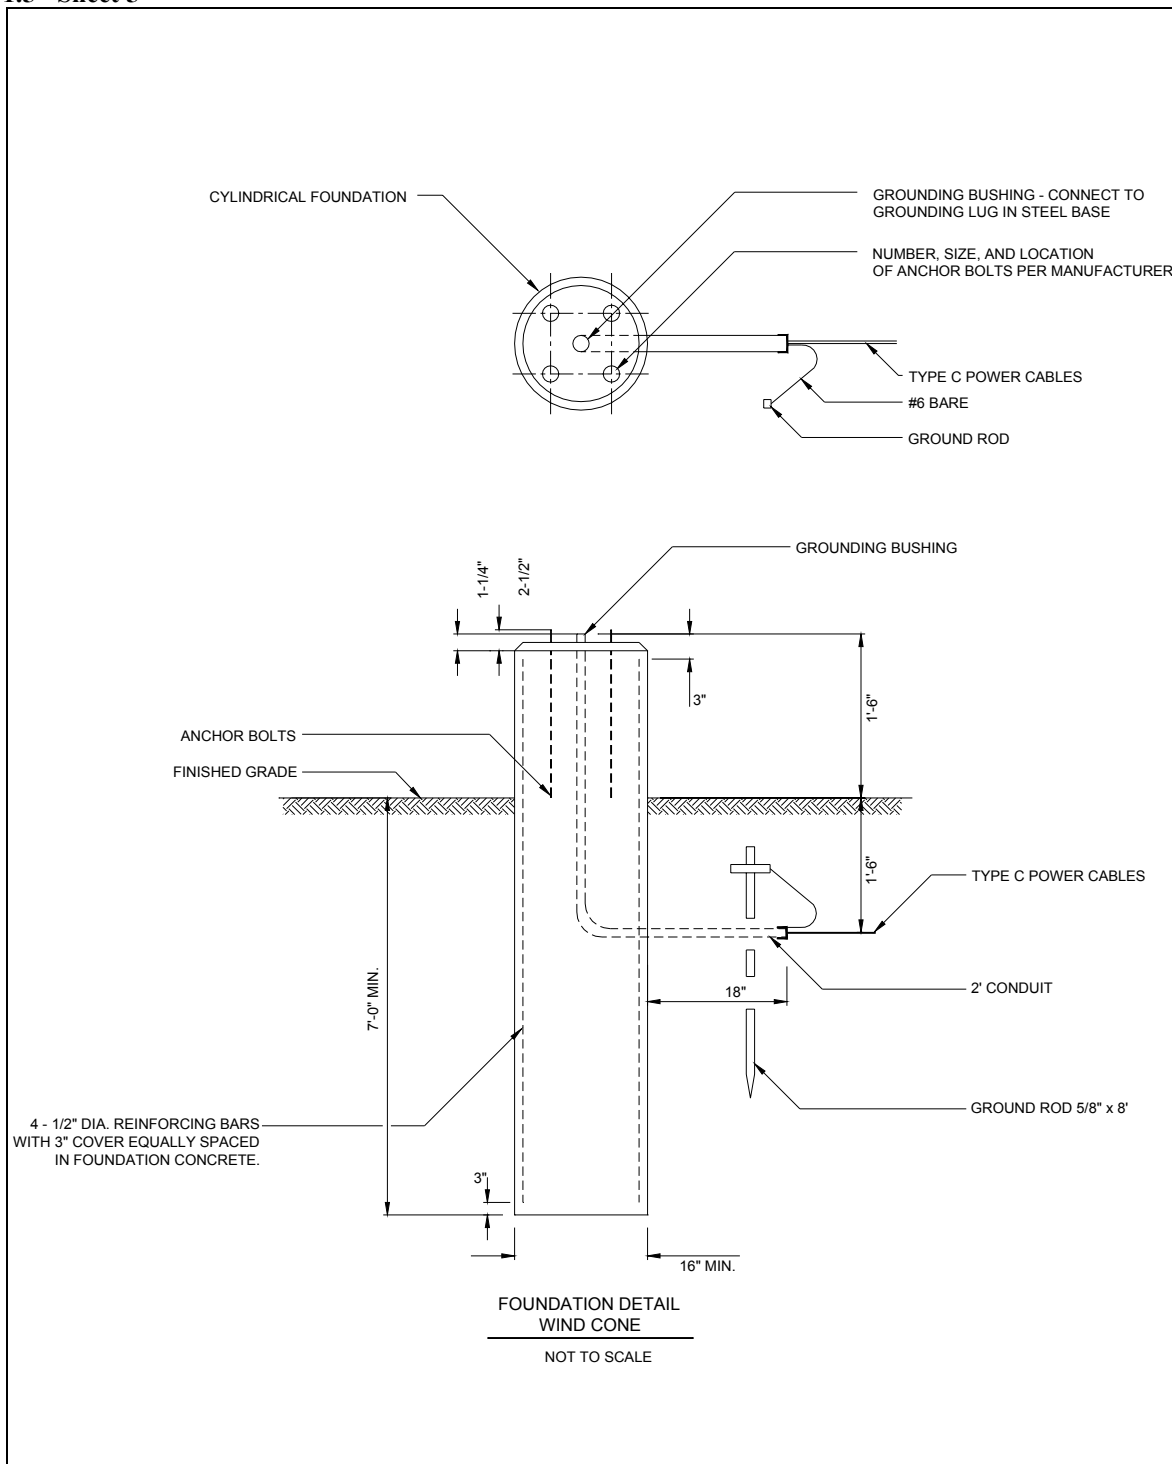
Standard Details for Wind Cone – GL-600 Sheet 5A – Foundation Detail Wind Cone
